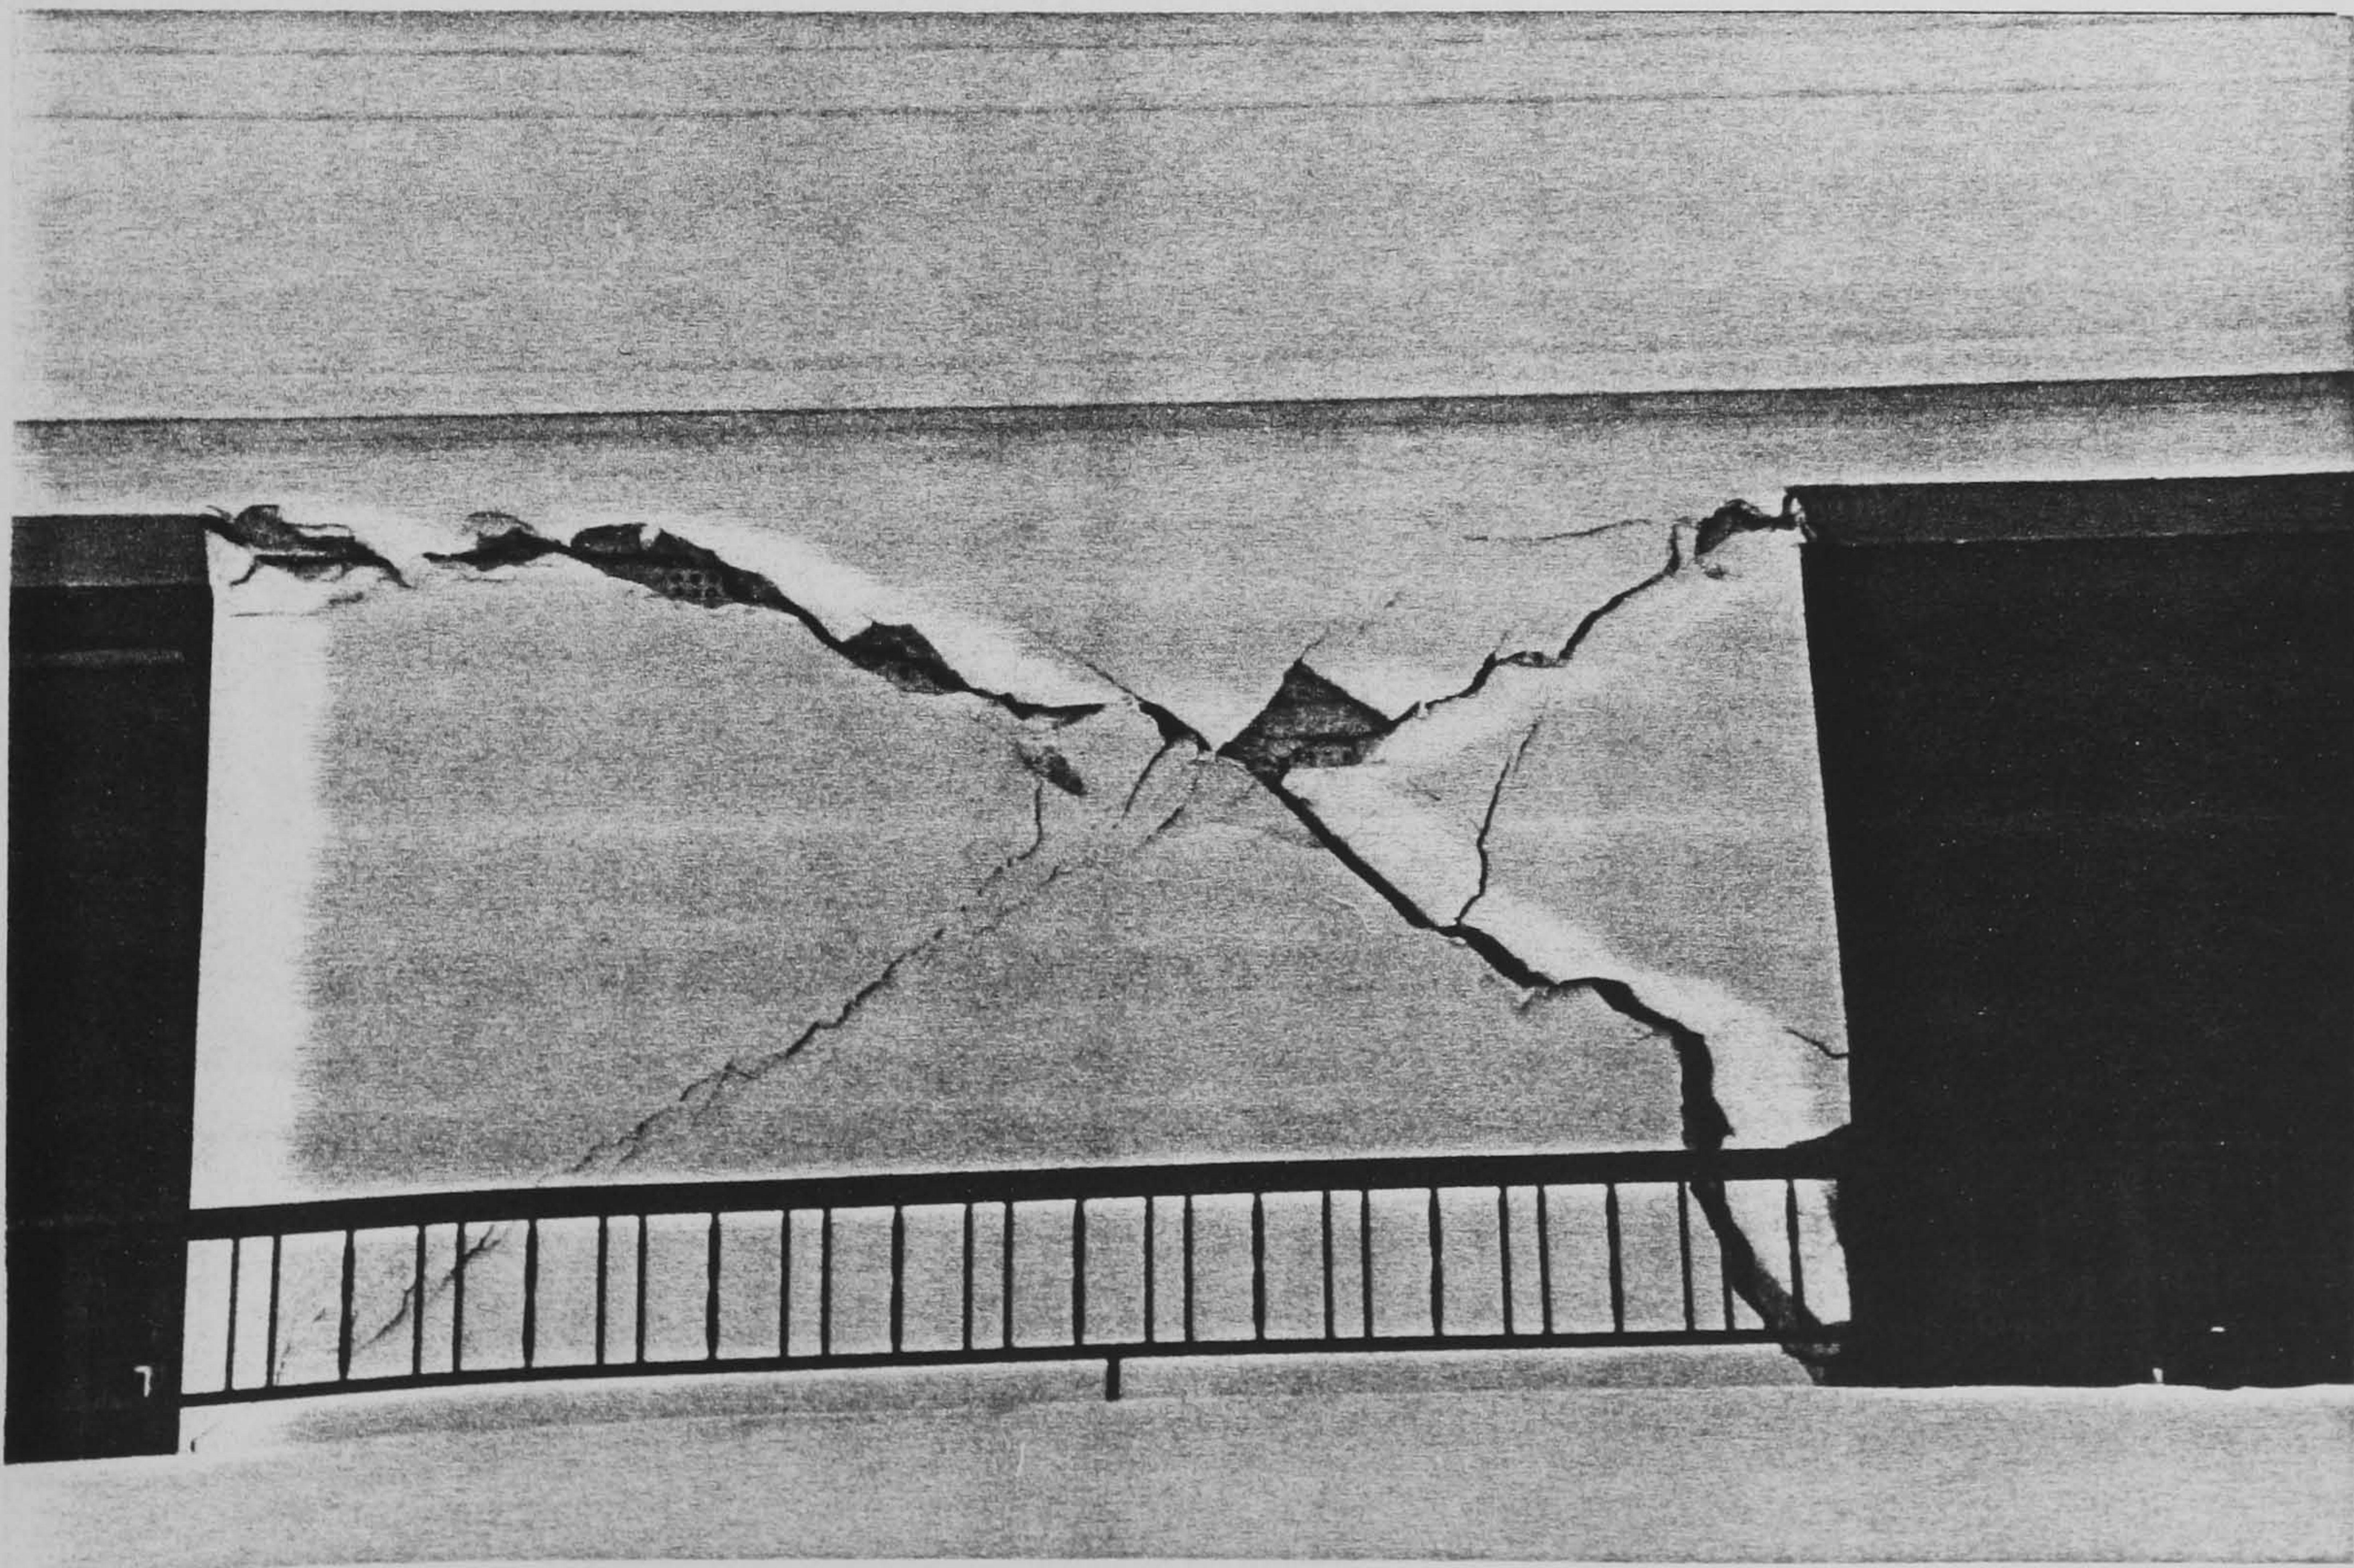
Cross-diagonal tensile non-symmetrical failure of masonry infill wall
